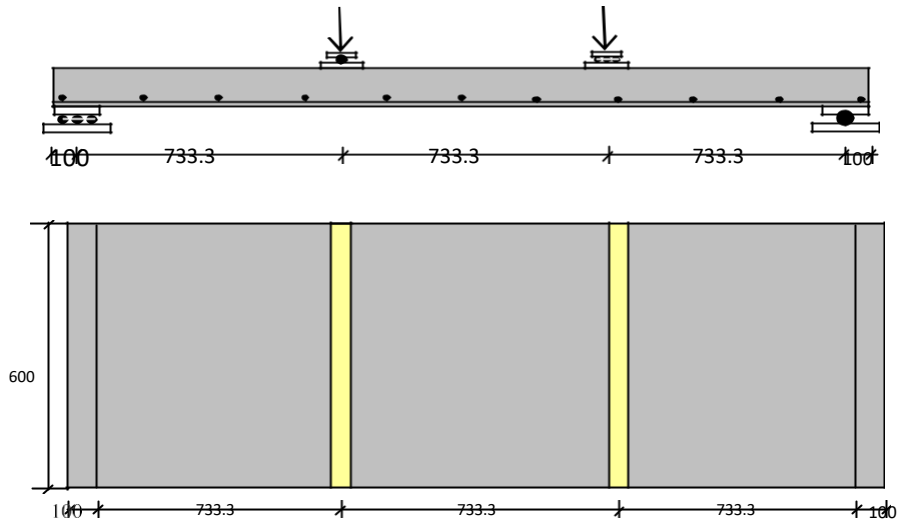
Model of one-sided plate with loading device (all dimensions are in mm)
